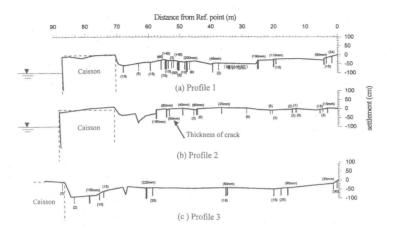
Deformation profiles of Pier #1 to #3 [3]
